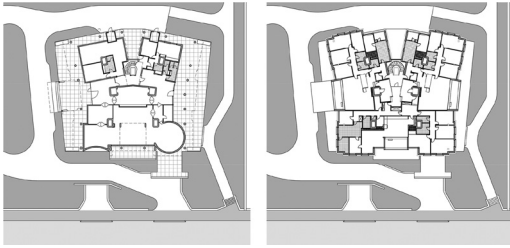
Social Security Building, Ground Floor and 1–12 floor (Vale 2011, 417).
